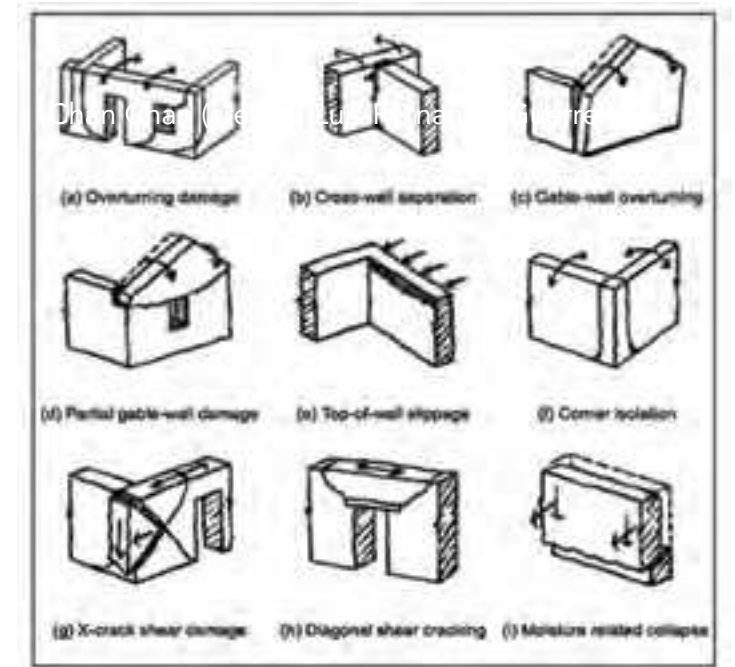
Typical out-of-plane and in-plane wall damage (credits: Fred Webster, 2012)
